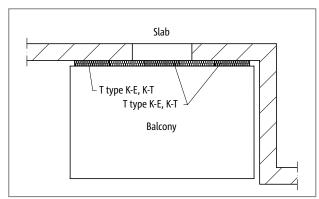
Schöck Isokorb® T type K-E, K-T: Balcony with façade offset
